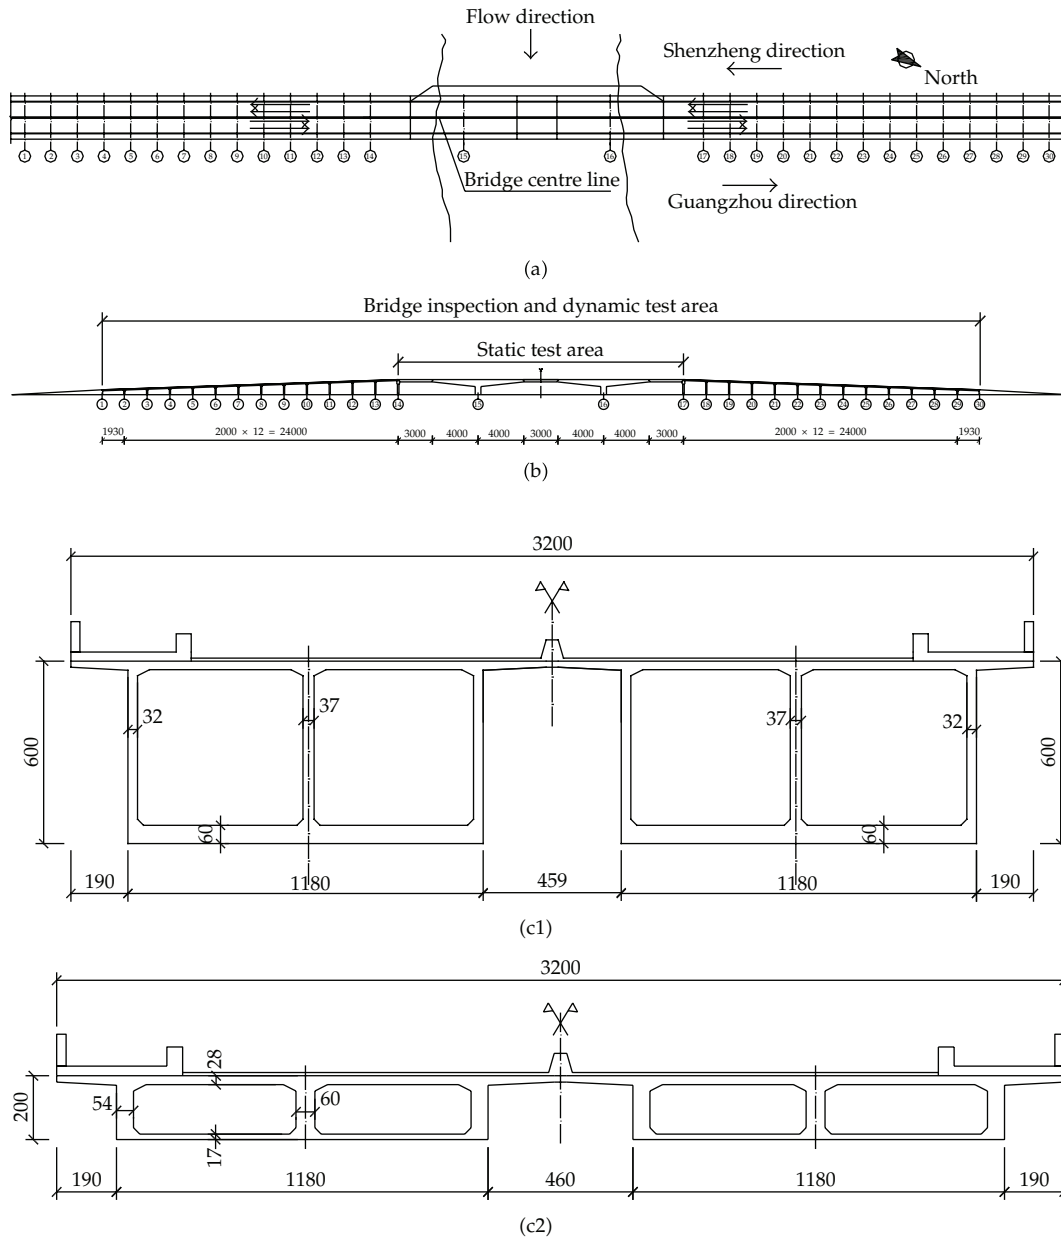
General view of Quhai T-frame bridge: (a) plan view; (b) elevation view; (c) typical cross-section of box-girder deck.
